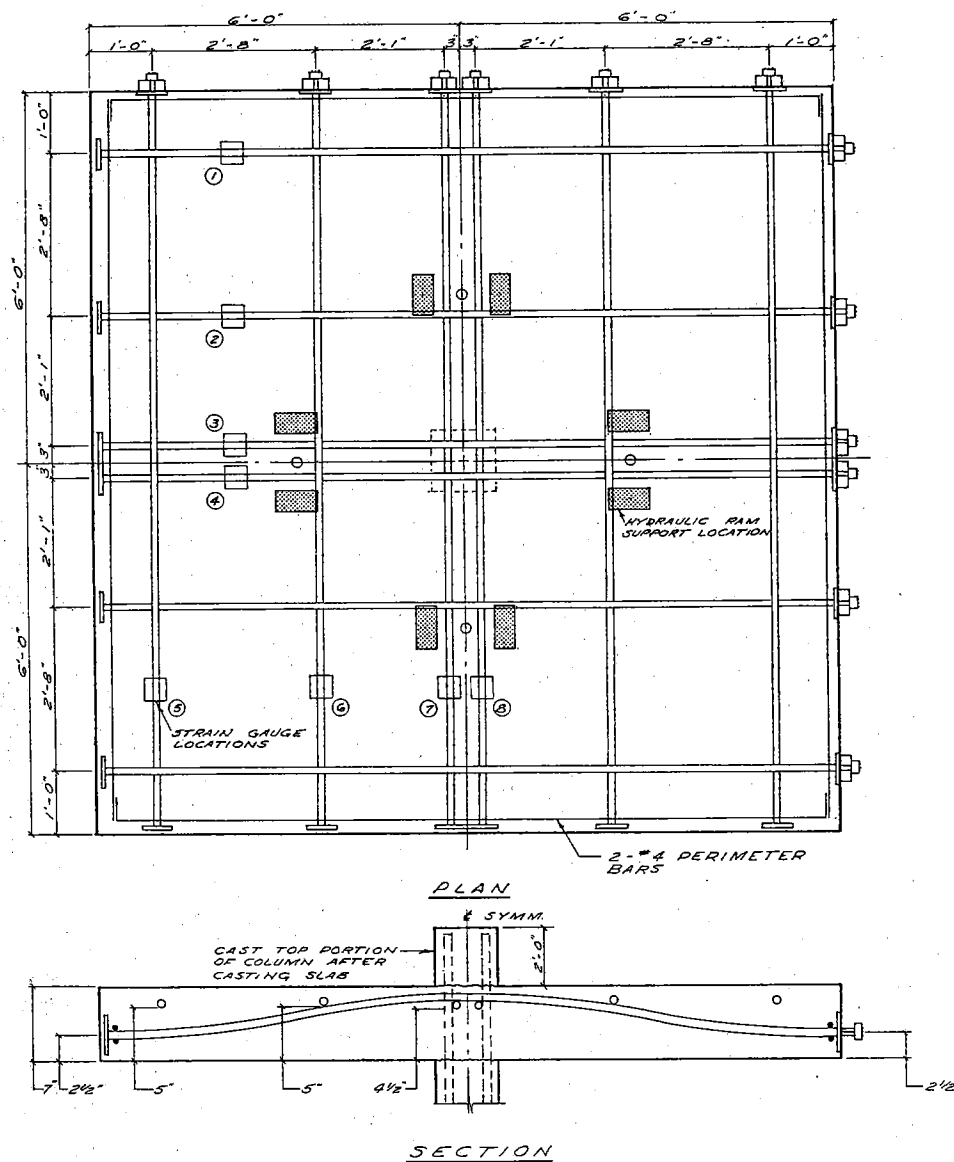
Tendon layout for Specimen C-1 (without supplemental reinforcement)—typical of the cast-in-place slab specimens
